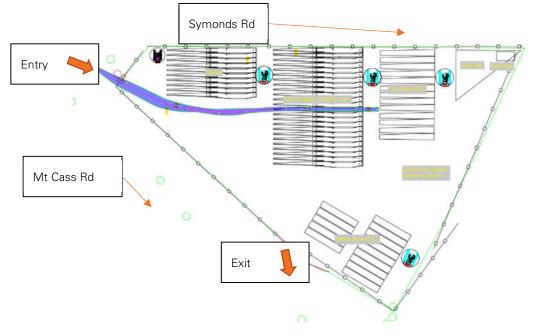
Indicative Construction Yard Layout at the intersection of Mt Cass and Symonds Rd
